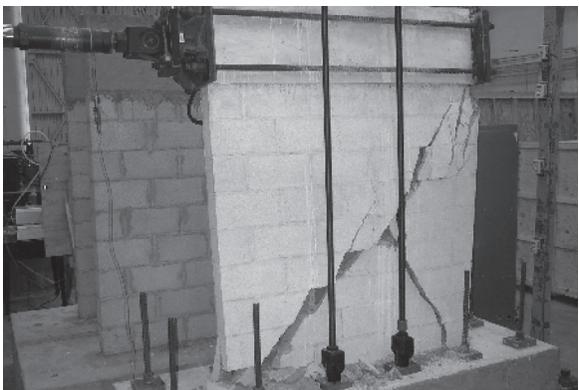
Shear Failure of the As-built Wall Sample.
